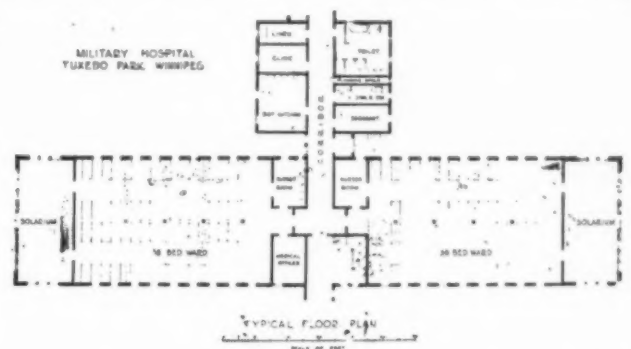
Typical floor plan of the Military Hospital, Tuxedo Park, Winnipeg, Canada.
